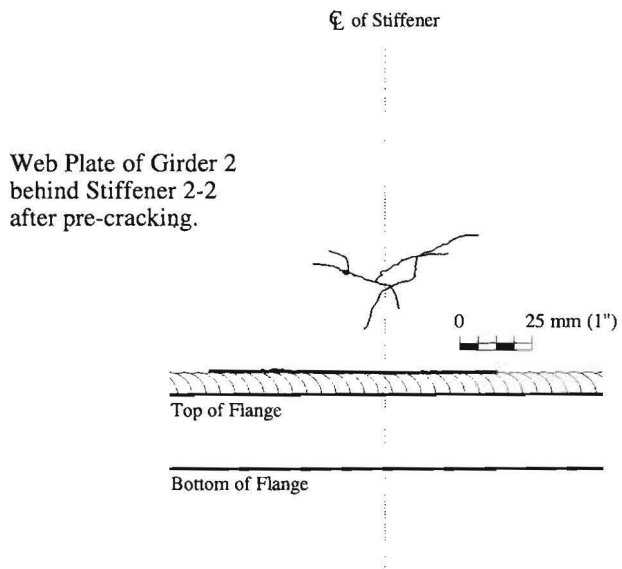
Pre-cracking in web plate of Girder 2 behind Stiffener 2.
